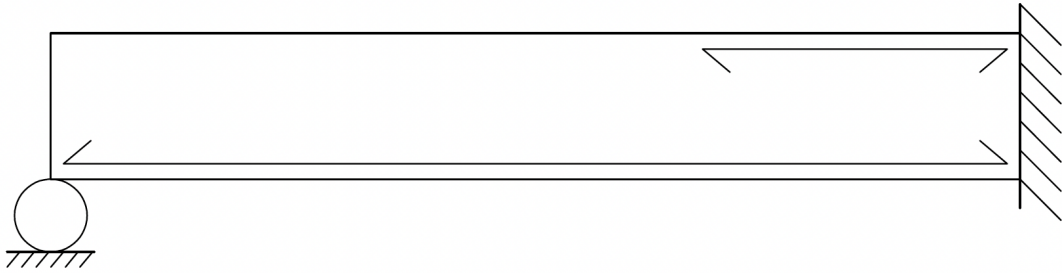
Schematic illustration of the two span slab model used in the slab parameter study, showing the assumed support condition and the reinforcement considered in the support and field sections.
